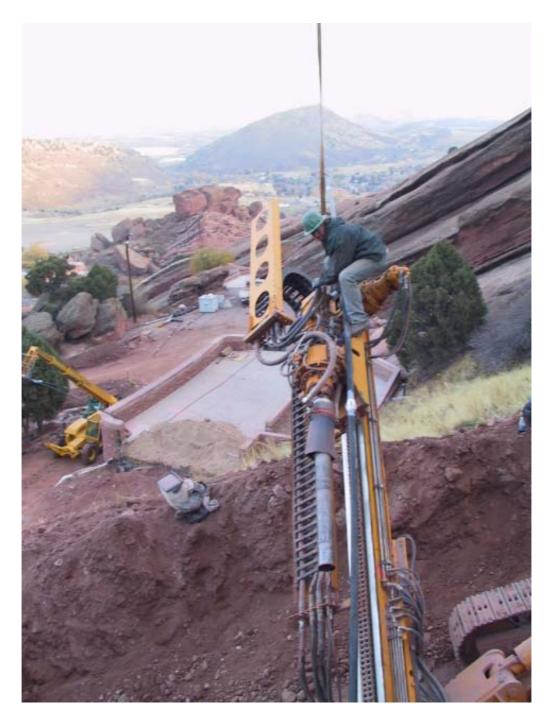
Ground anchors were installed to stabilize the south slope and keep the planters along the amphitheatre seating shored during construction.
